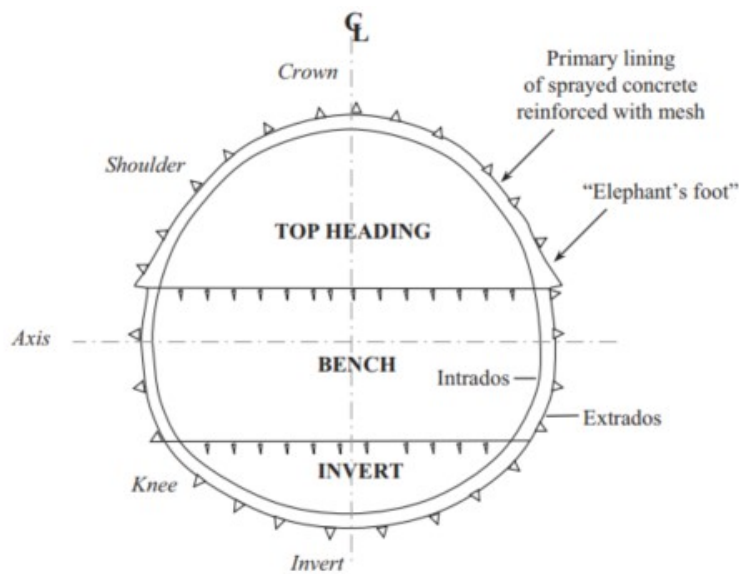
Cross-section of an SCL tunnel in soft ground [11].
